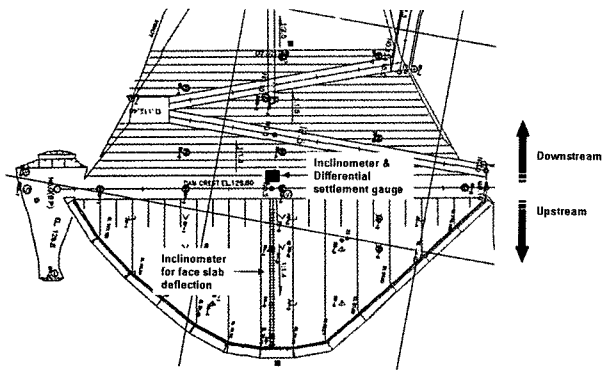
Overall plan view of dam and locations of instrumentation equipments
